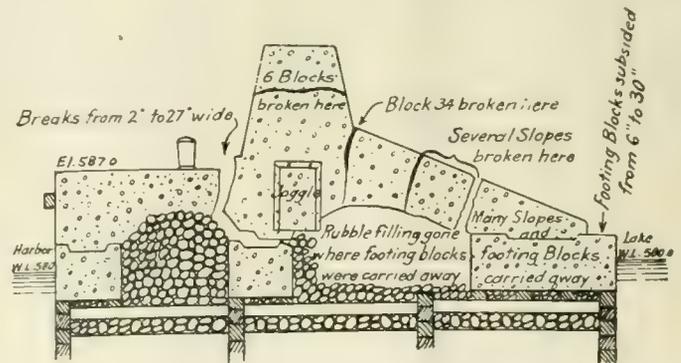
Typical Section of Harbor Beach Breakwater Showing Damage Done by Waves.
